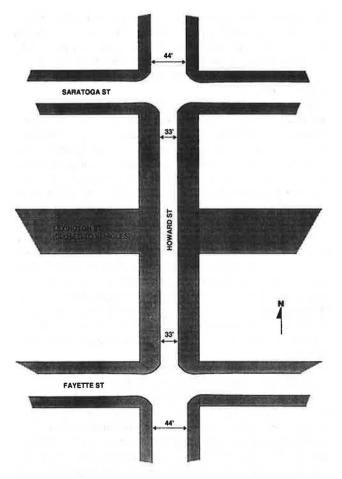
Curb and sidewalk configuration in the Lexington Mall area.
